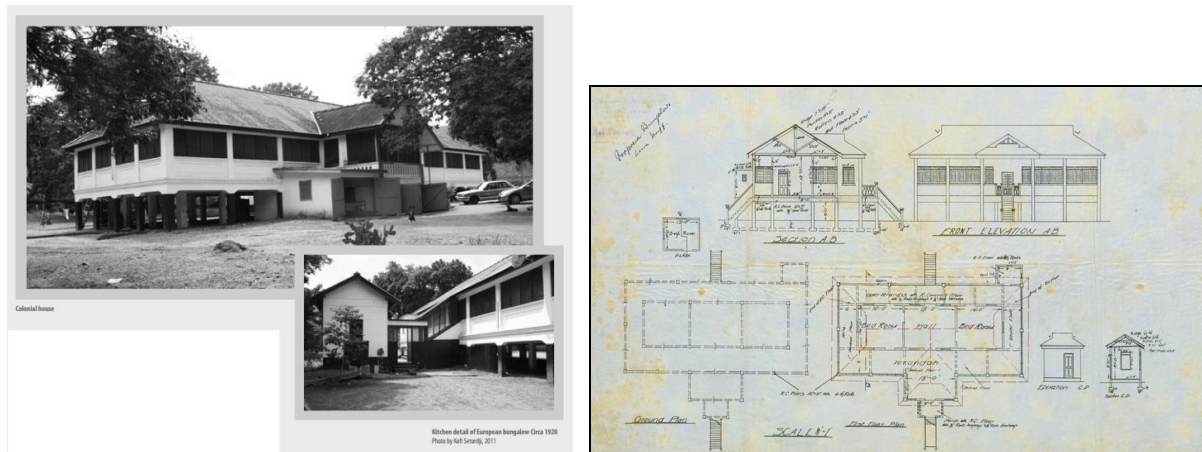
A photograph and plan of a colonial housing located in Ridge, Accra. These houses are now being demolished and replaced with multilevel residential apartments and commercial buildings
